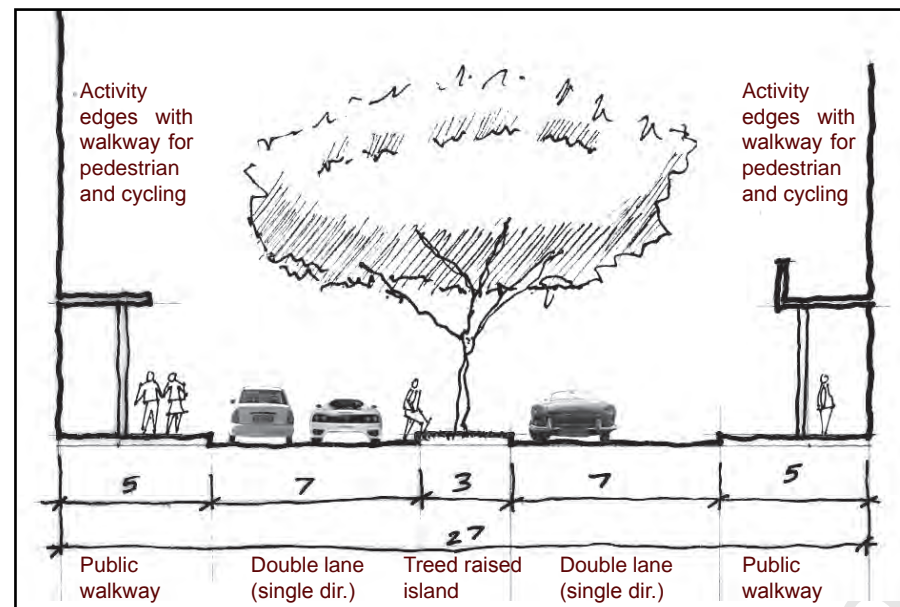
Generic section through a busy road - Main Road (Source: Author's sketch)
